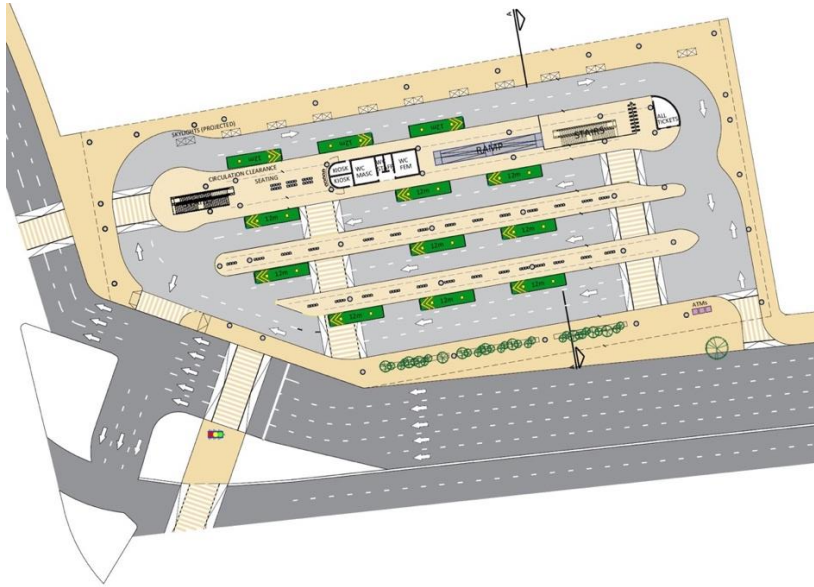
Representative bus terminal layout with raised boarding areas, a continuous pedestrian realm, crosswalks, and connections to nearby streets. (Location: Cairo)
